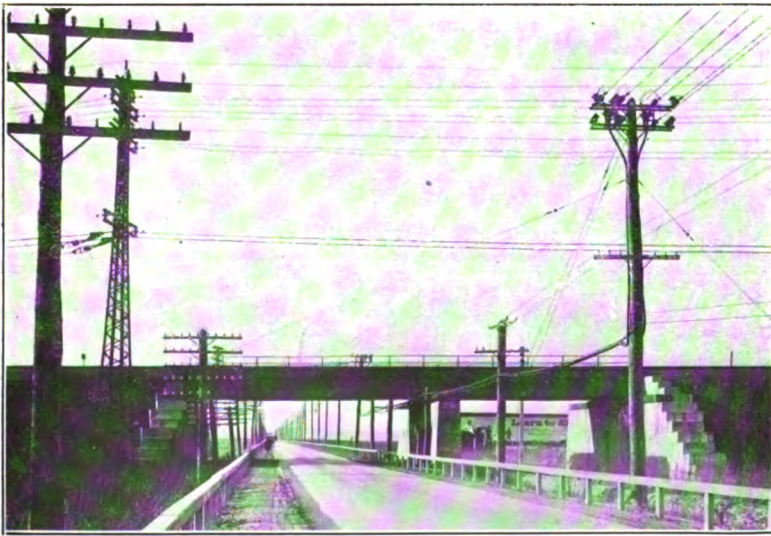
26,000-VOLT CABLE CROSSING UNDER RAILROAD BRIDGE AND
